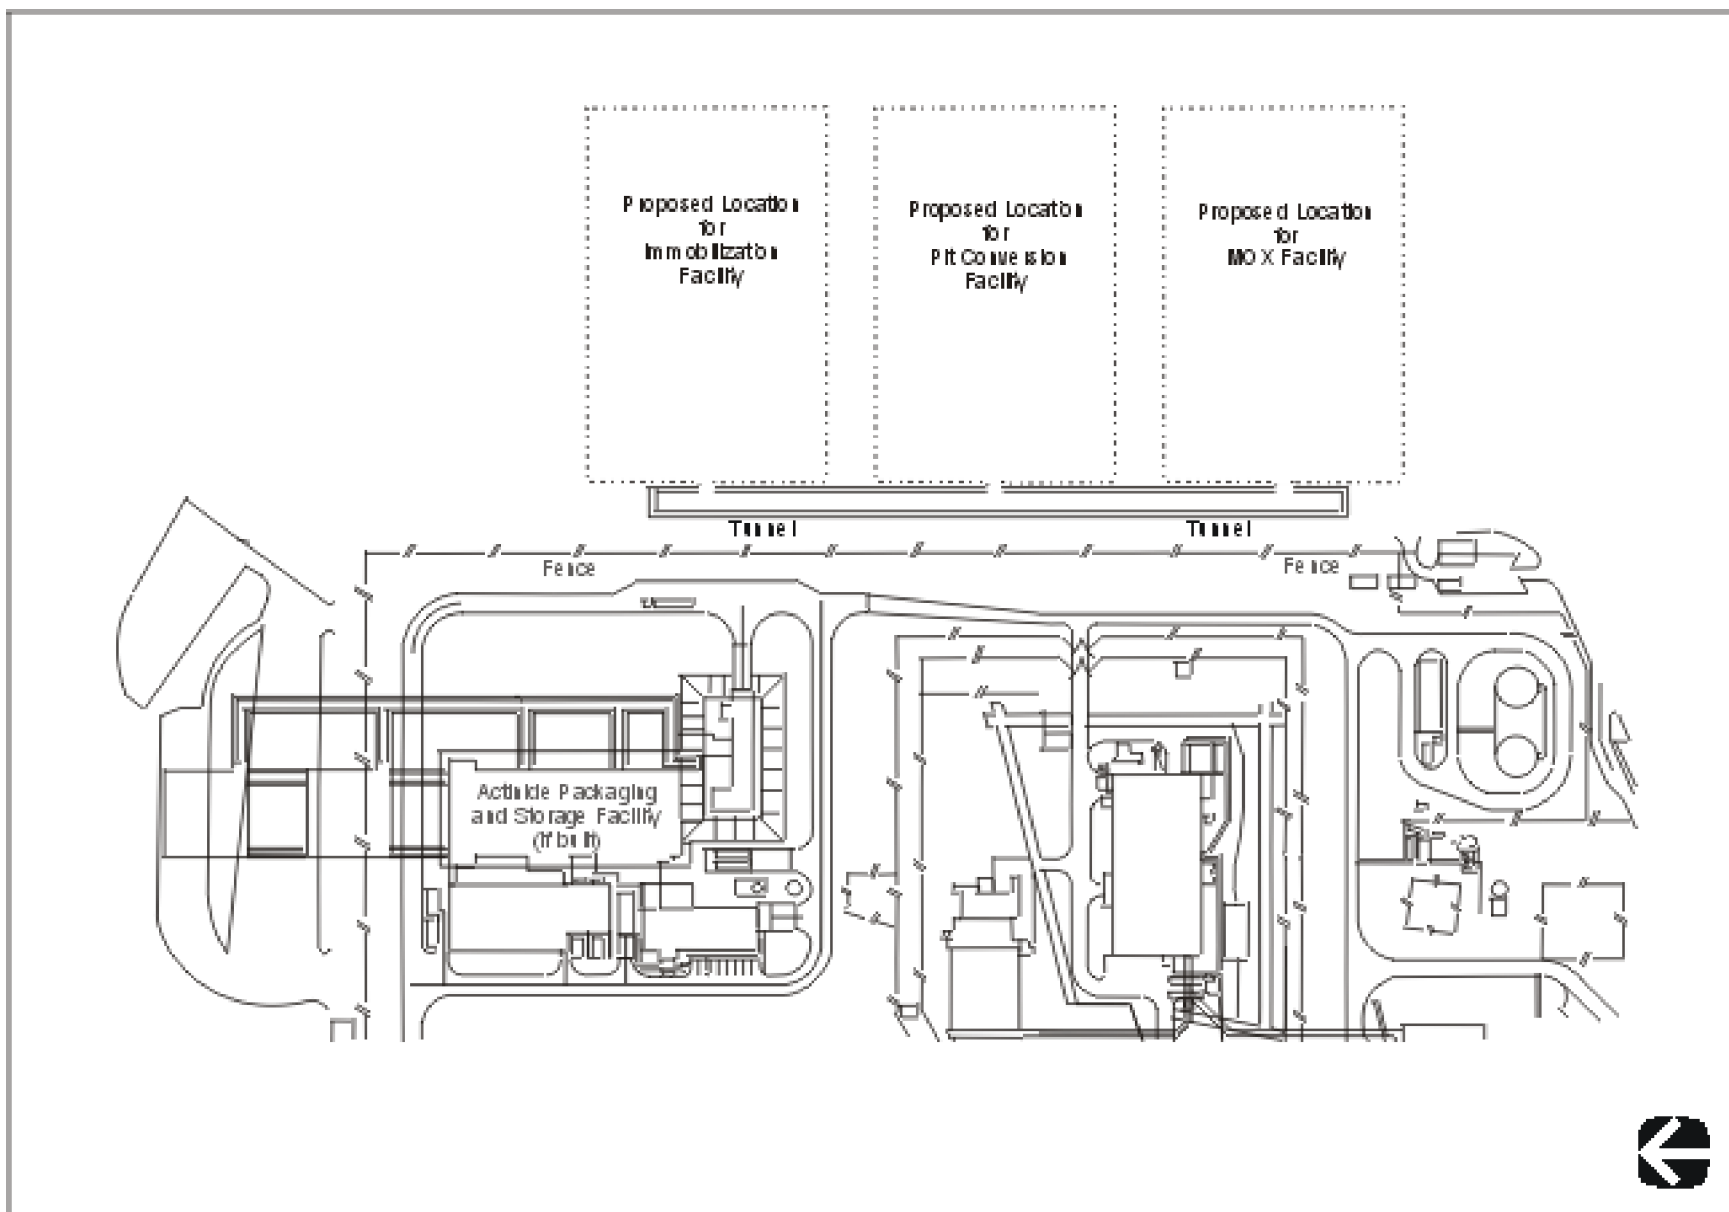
Proposed Facility Locations in F-Area at SRS
